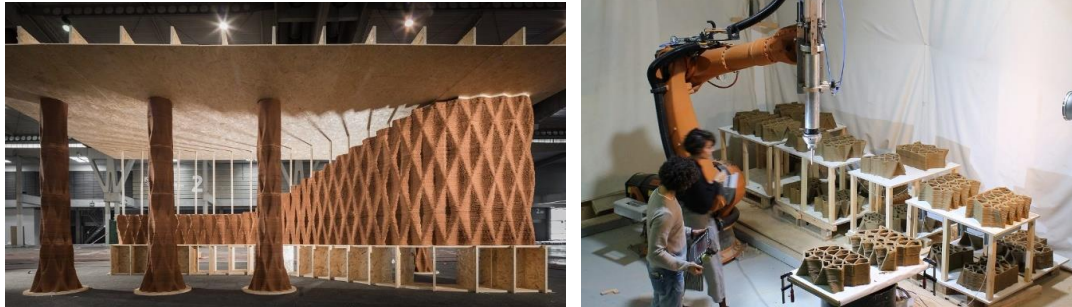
Barcelona Building Construmat, 2017 IAAC Pavilion (URL – 21)
